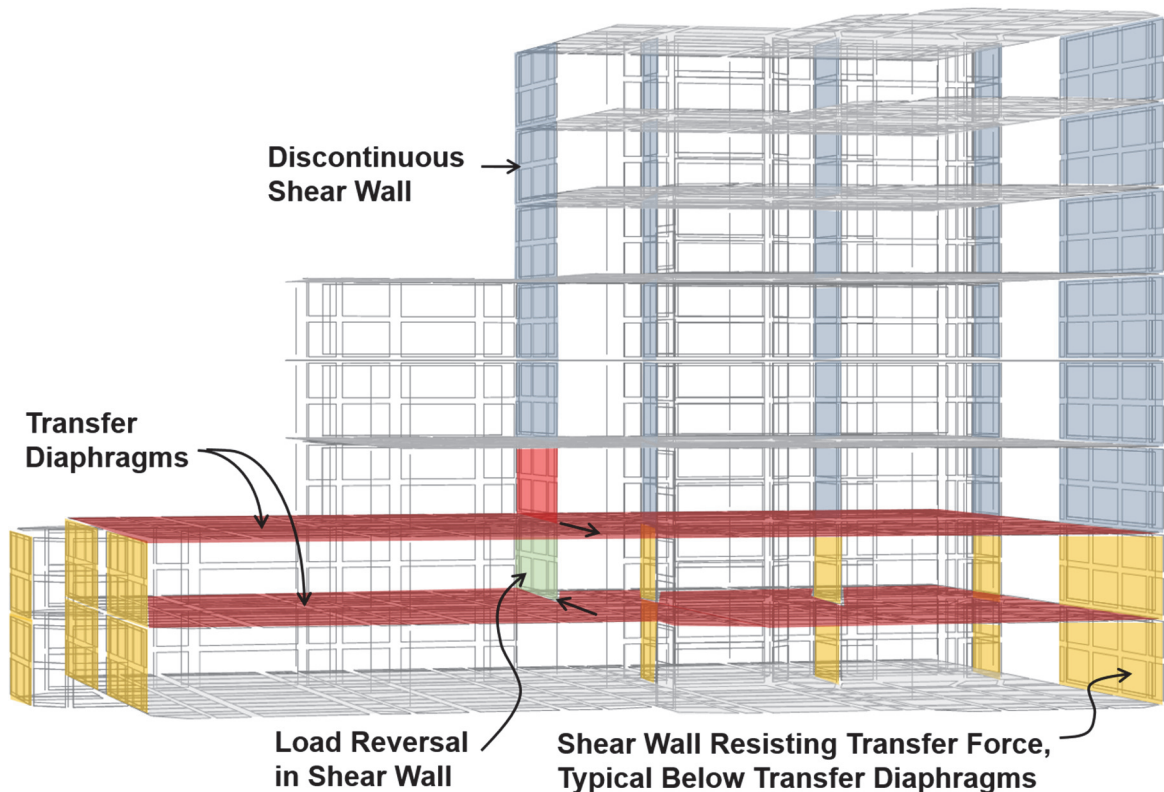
Concentrated force transfer out of discontinuous wall in a rigid diaphragm.
